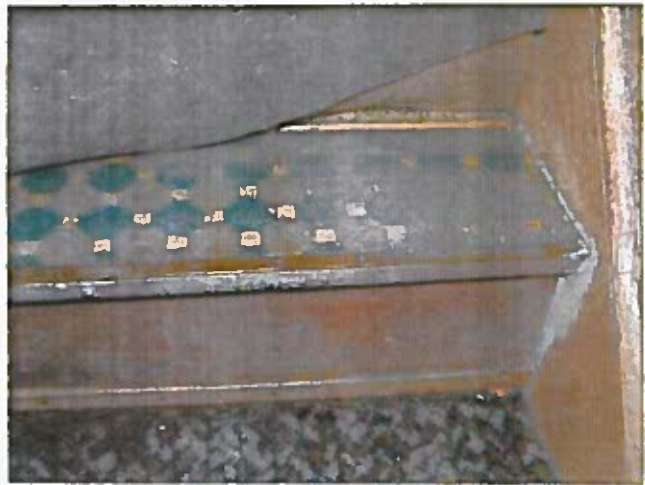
The upper run of wooden stair treads were covered with an octagon-patterned linoleum prior to the installation of the padded carpet.
